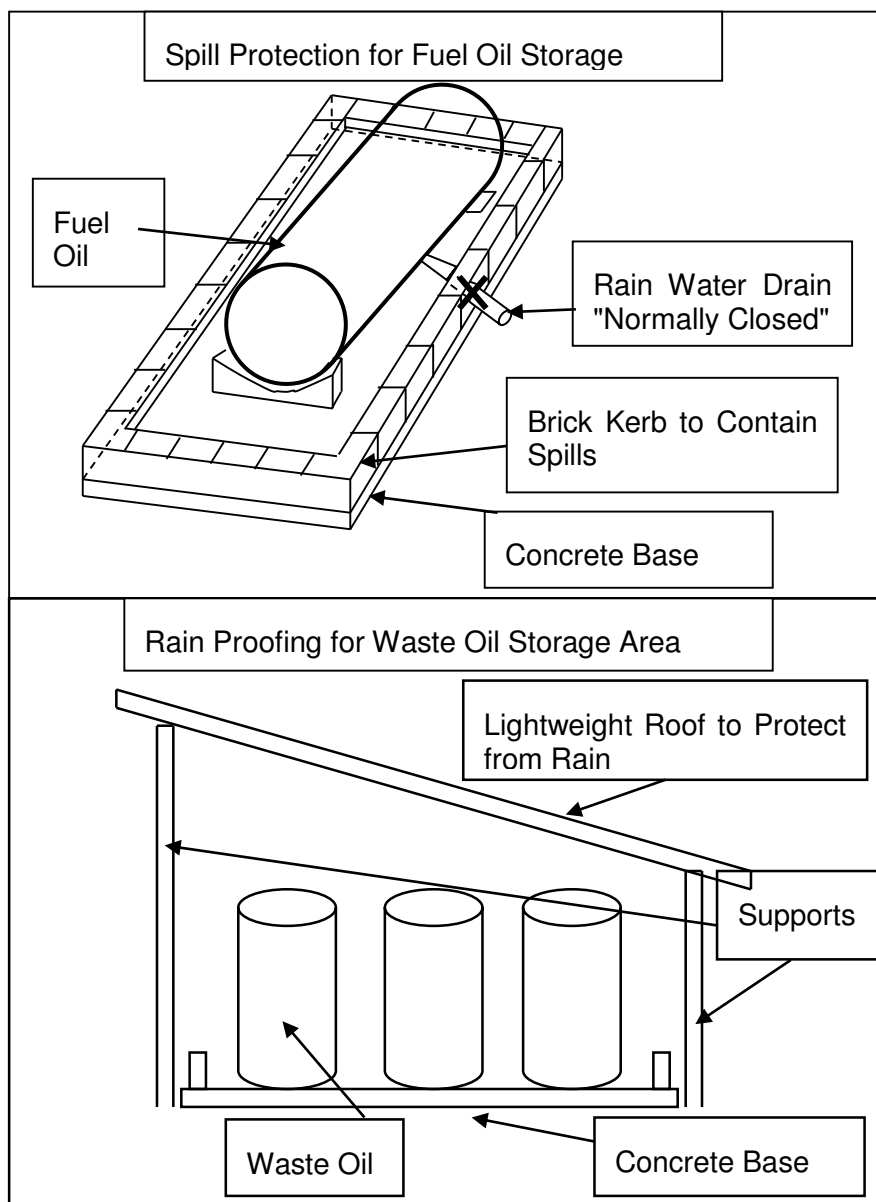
Spill Protection for Fuel Oil Storage / Rain Proofing for Waste Oil Storage
